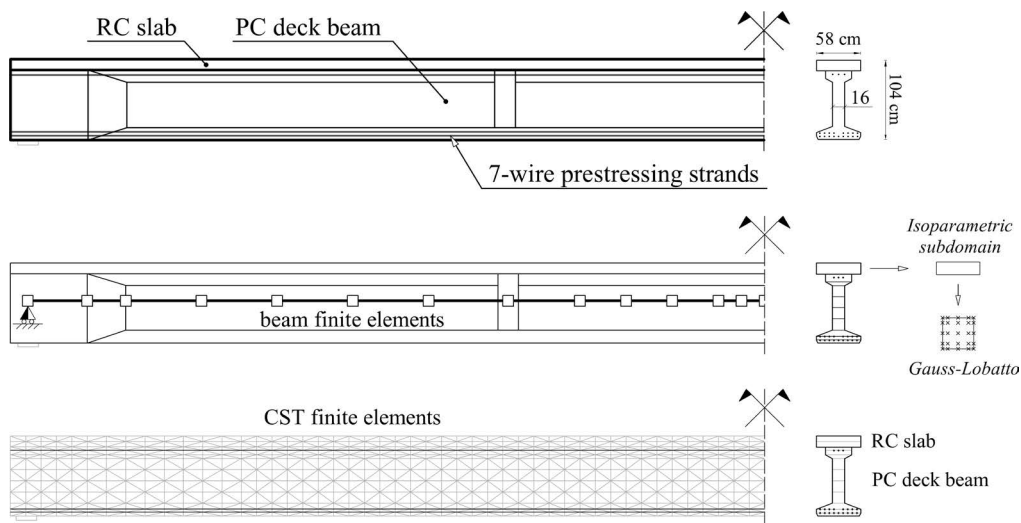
PC bridge deck beams: Longitudinal profile, structural modeling, and element discretization based on BFE model with isoparametric discretization and Gauss-Lobatto integration scheme and MCFT model with CST finite elements.
